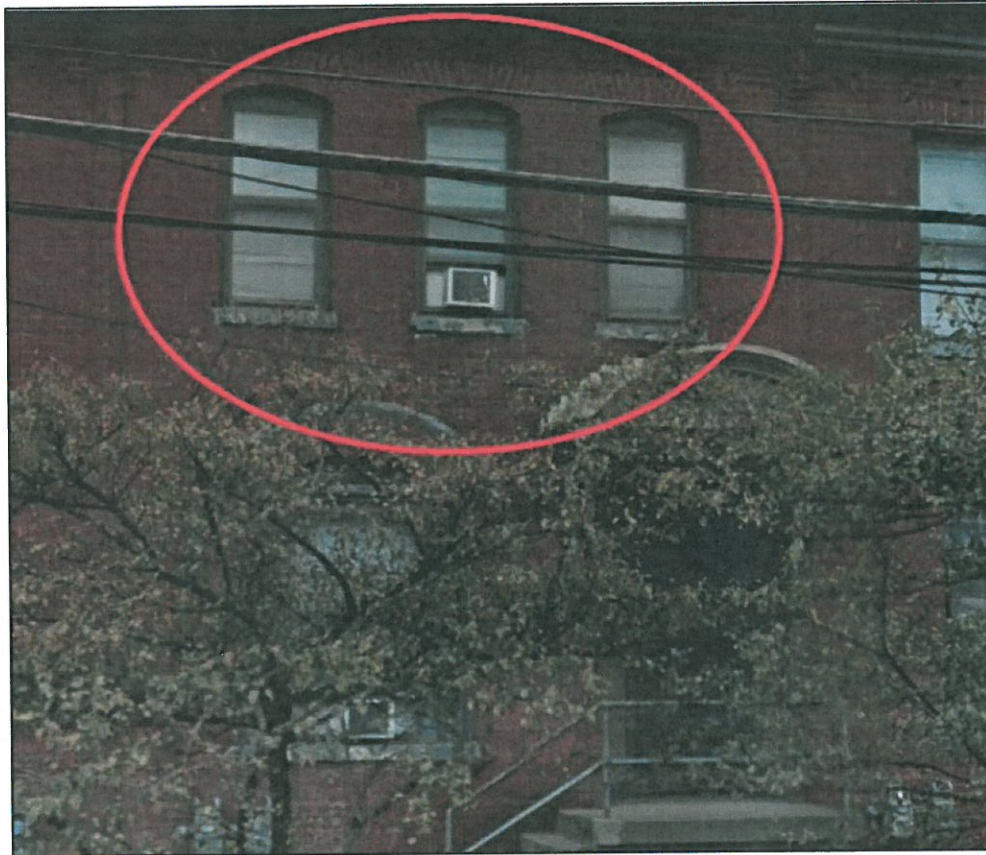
2017 Google Photo showing the previous wood under the segmented arch over 612 W. Breckinridge Street.
